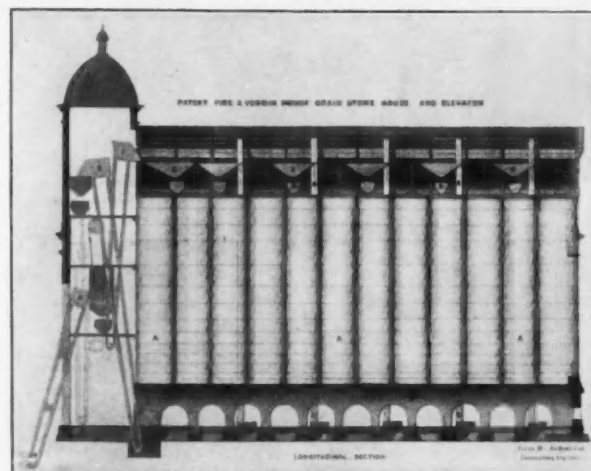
LONGITUDINAL SECTION OF FIRST BRICK GRAIN ELEVATOR, BUILT AT BUFFALO, N. Y., 1869.
